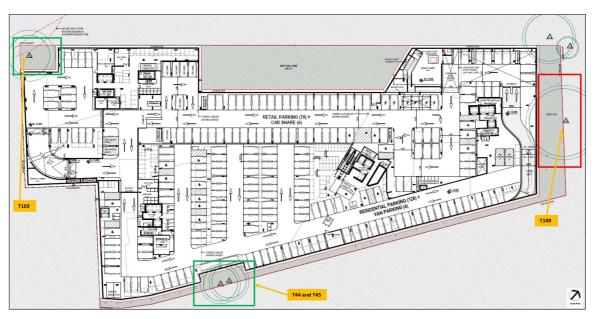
| Revision to basement footprint to retain additional trees 3, 44 and 45 and increase the TPZ for tree 109 (Source: Amended Landscape Plans)
